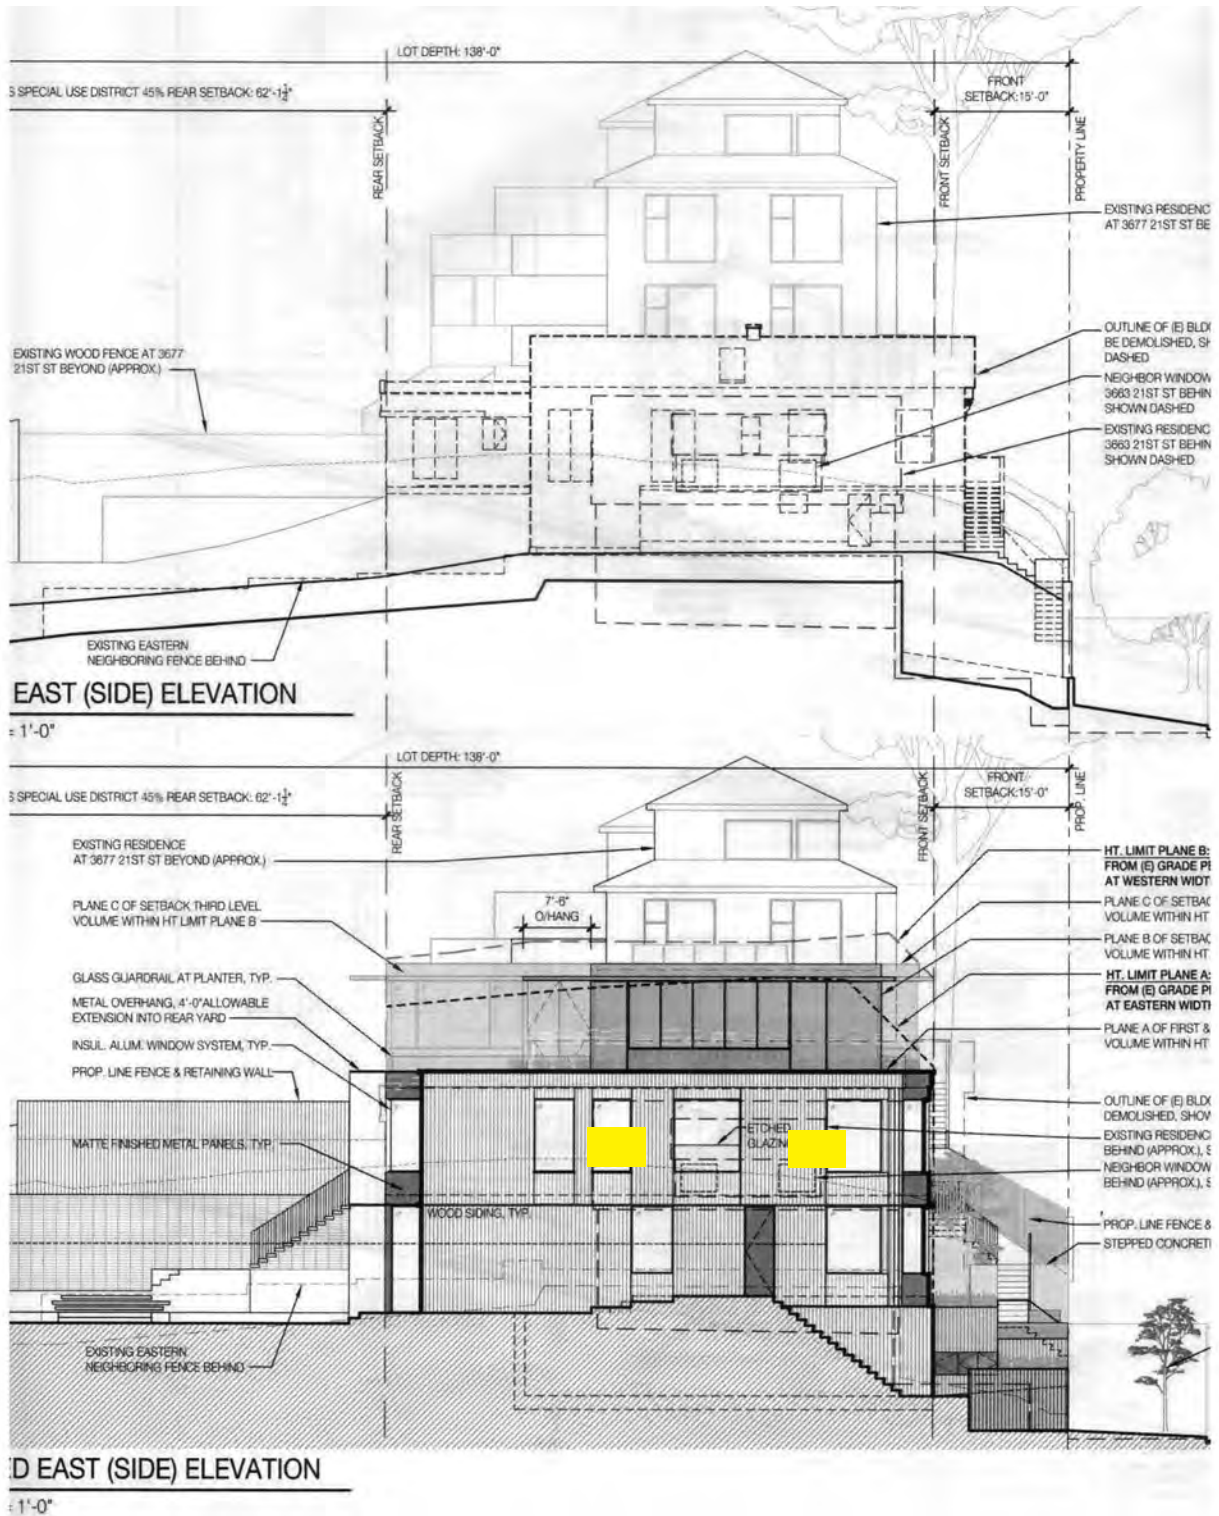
, detail of 3669 21st Street proposed site plan side elevation, sheet A-6, with approximate locations of 3663 21st Street second-floor windows shown in yellow. While existing property also had facing windows, there was privacy through a lot's distance and plantings.
